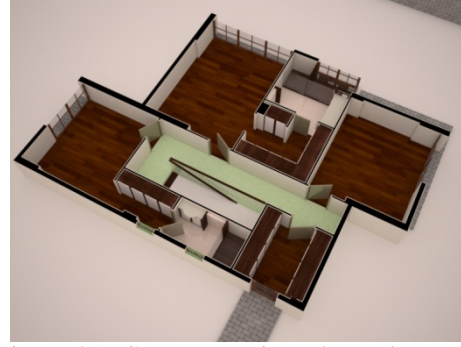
CB House First Floor Plan Image (Argeus Mimarlık, 2013)
